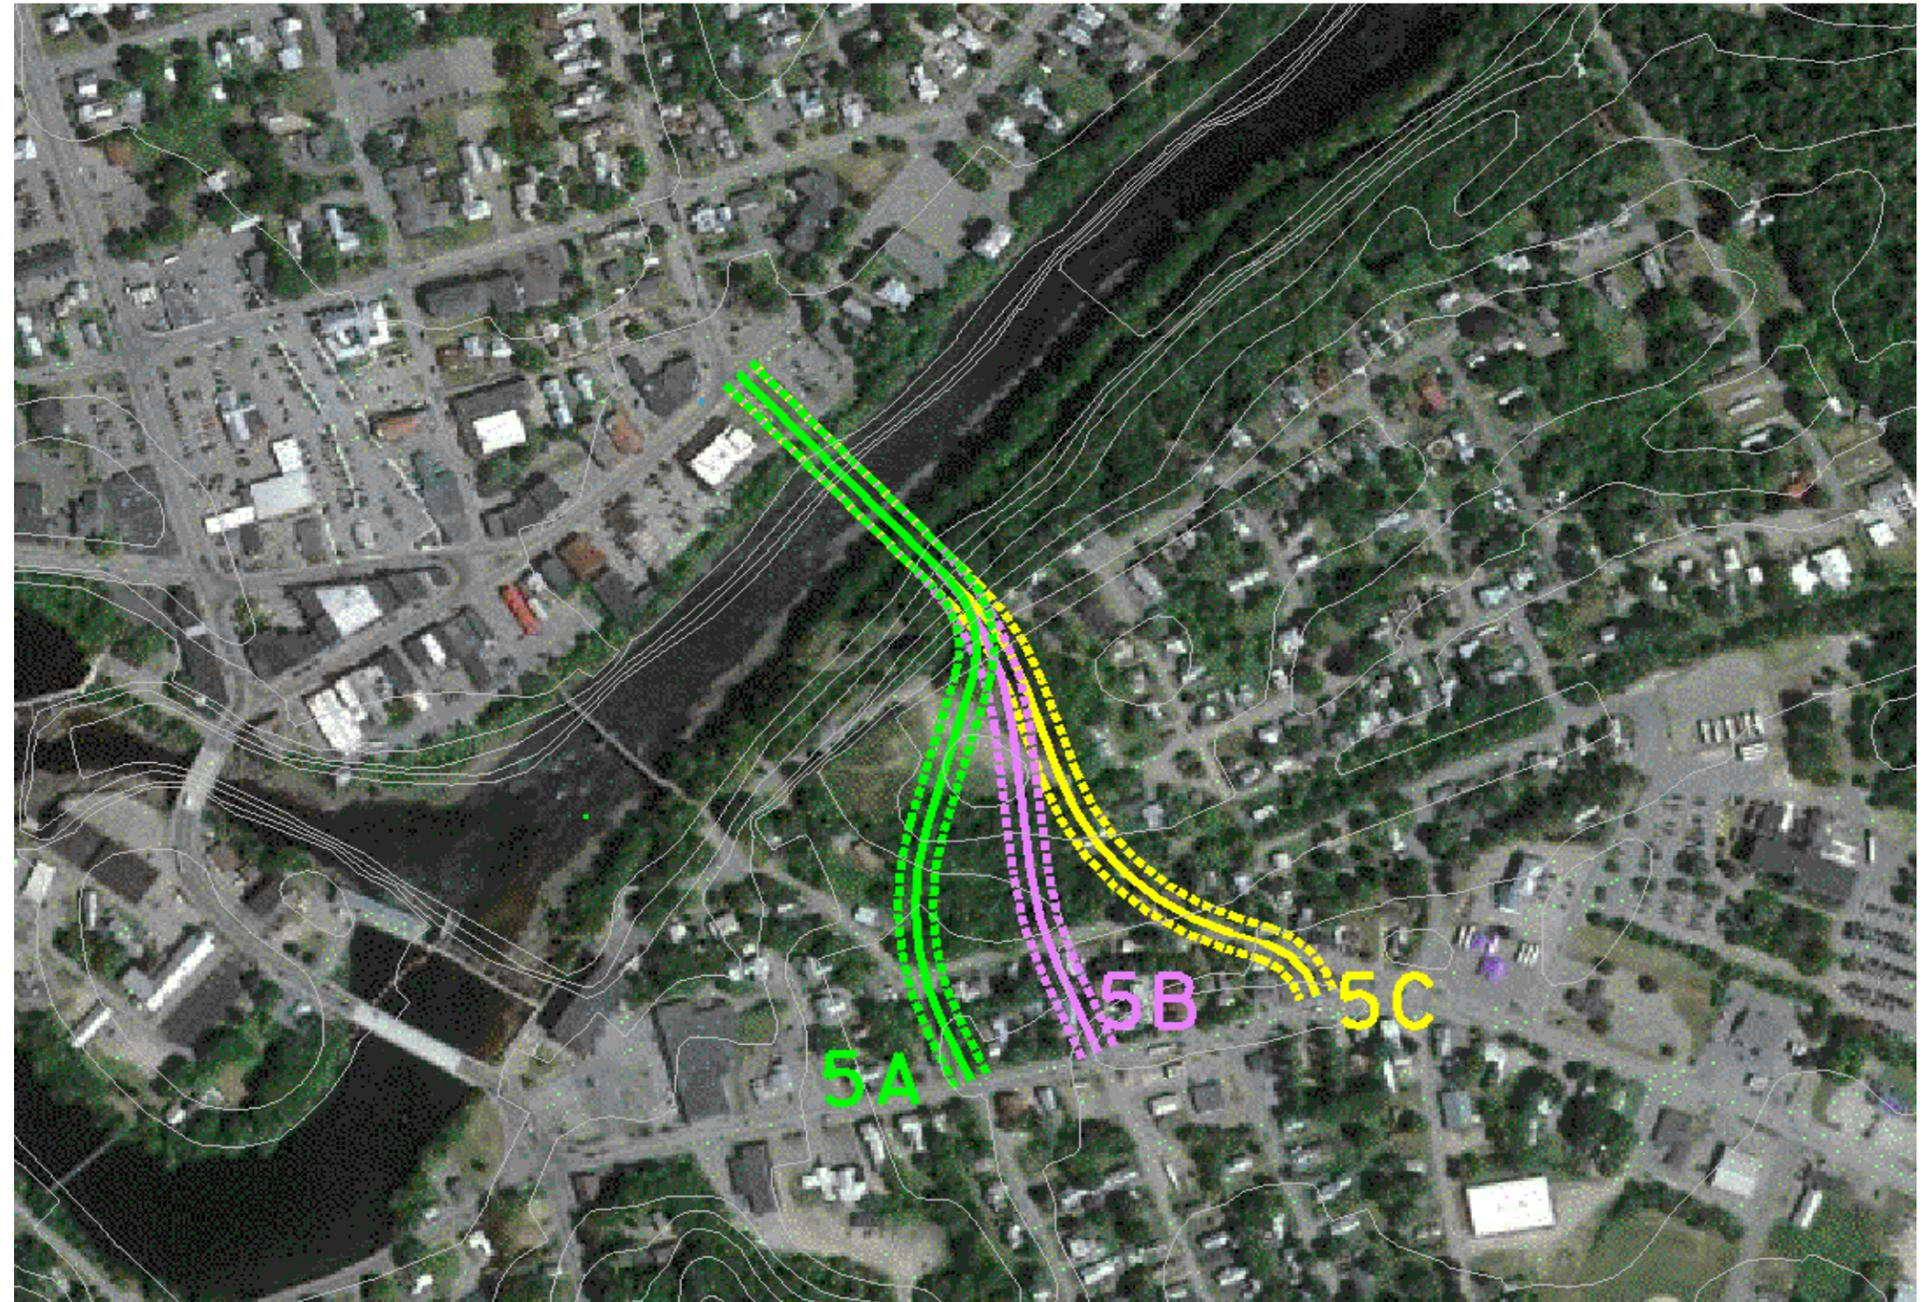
A5 Downtown Bridge Crossing Concept
